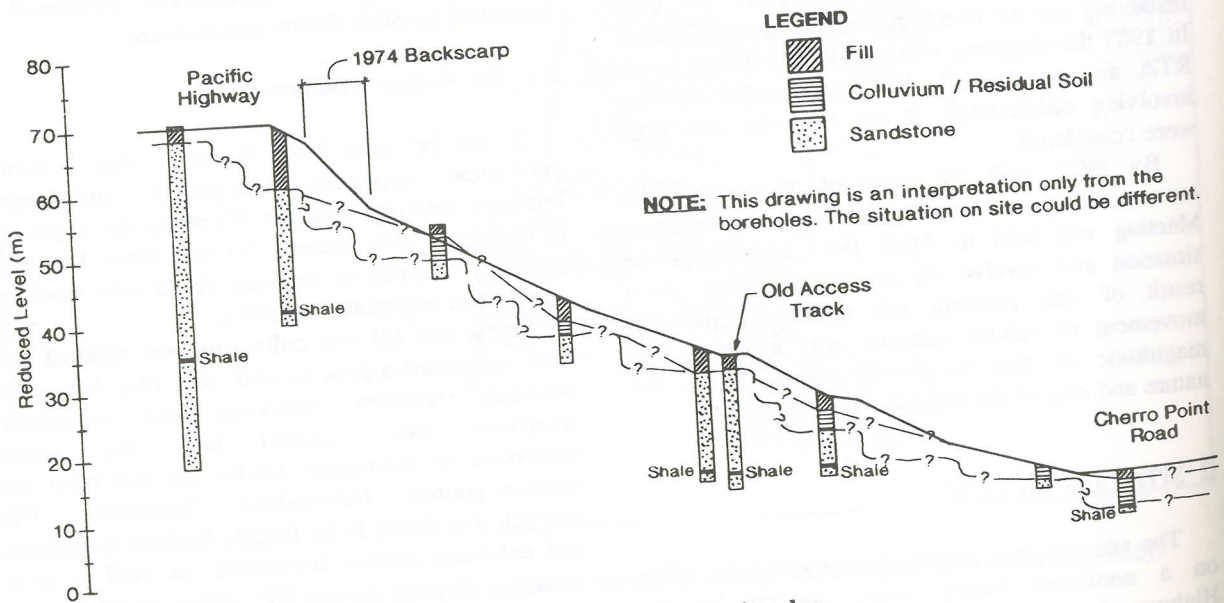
Section 1, taken from site plan (showing typical geological sequence)
